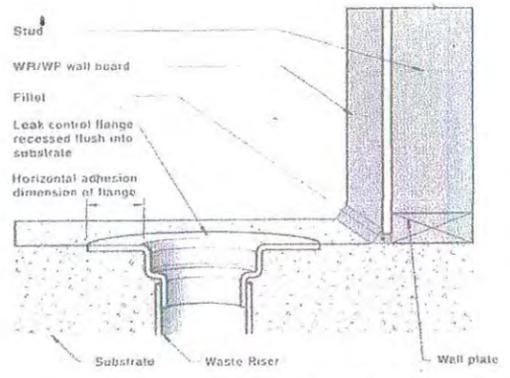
(C) - Generic leak control flange adjacent to a wall
